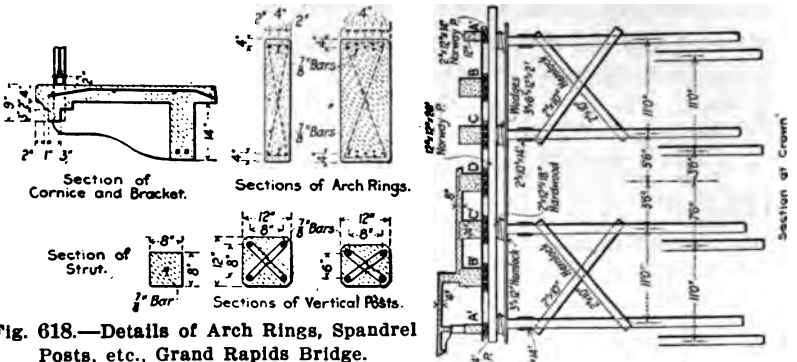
Details of Arch Rings, Spandrel Posts, etc., Grand Rapids Bridge.
